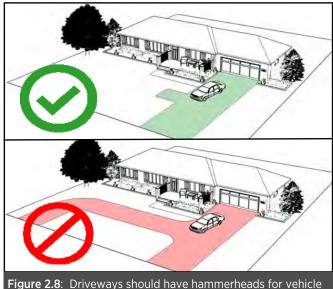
Driveways should have hammerheads for vehicle turn-around rather than circular driveways.
